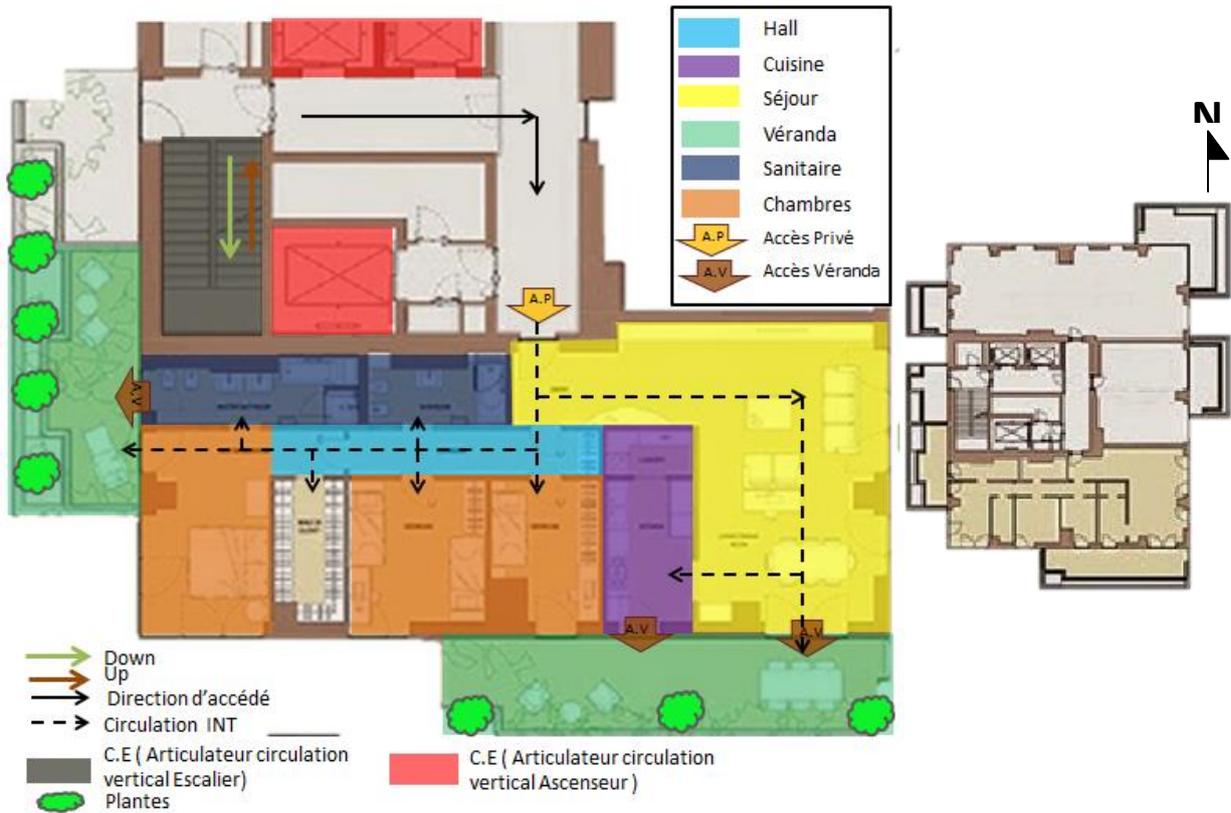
7th Floor plan .3 Rooms. Traiter par: Auteur
